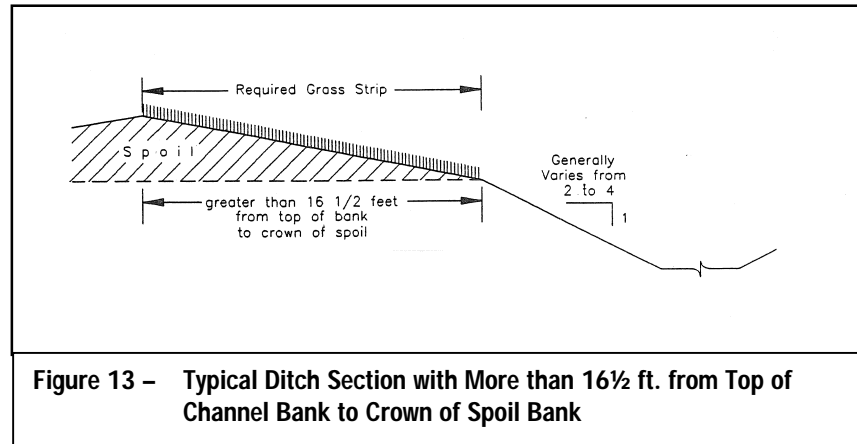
Typical Ditch Section with More than 16½ ft. from Top of Channel Bank to Crown of Spoil Bank
